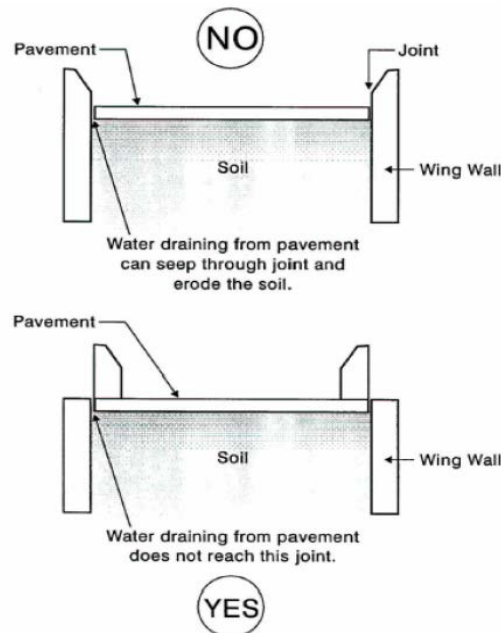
Cross Section of a Wingwall and Drainage System (Briaud et al., 1997).
